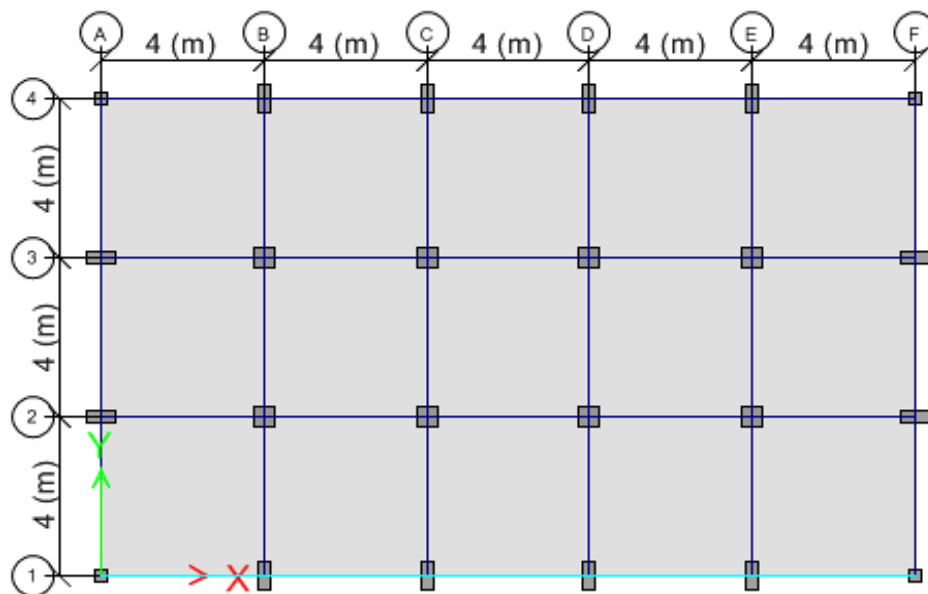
Schematic representation of typical floors Plan of the 6-story residential building
